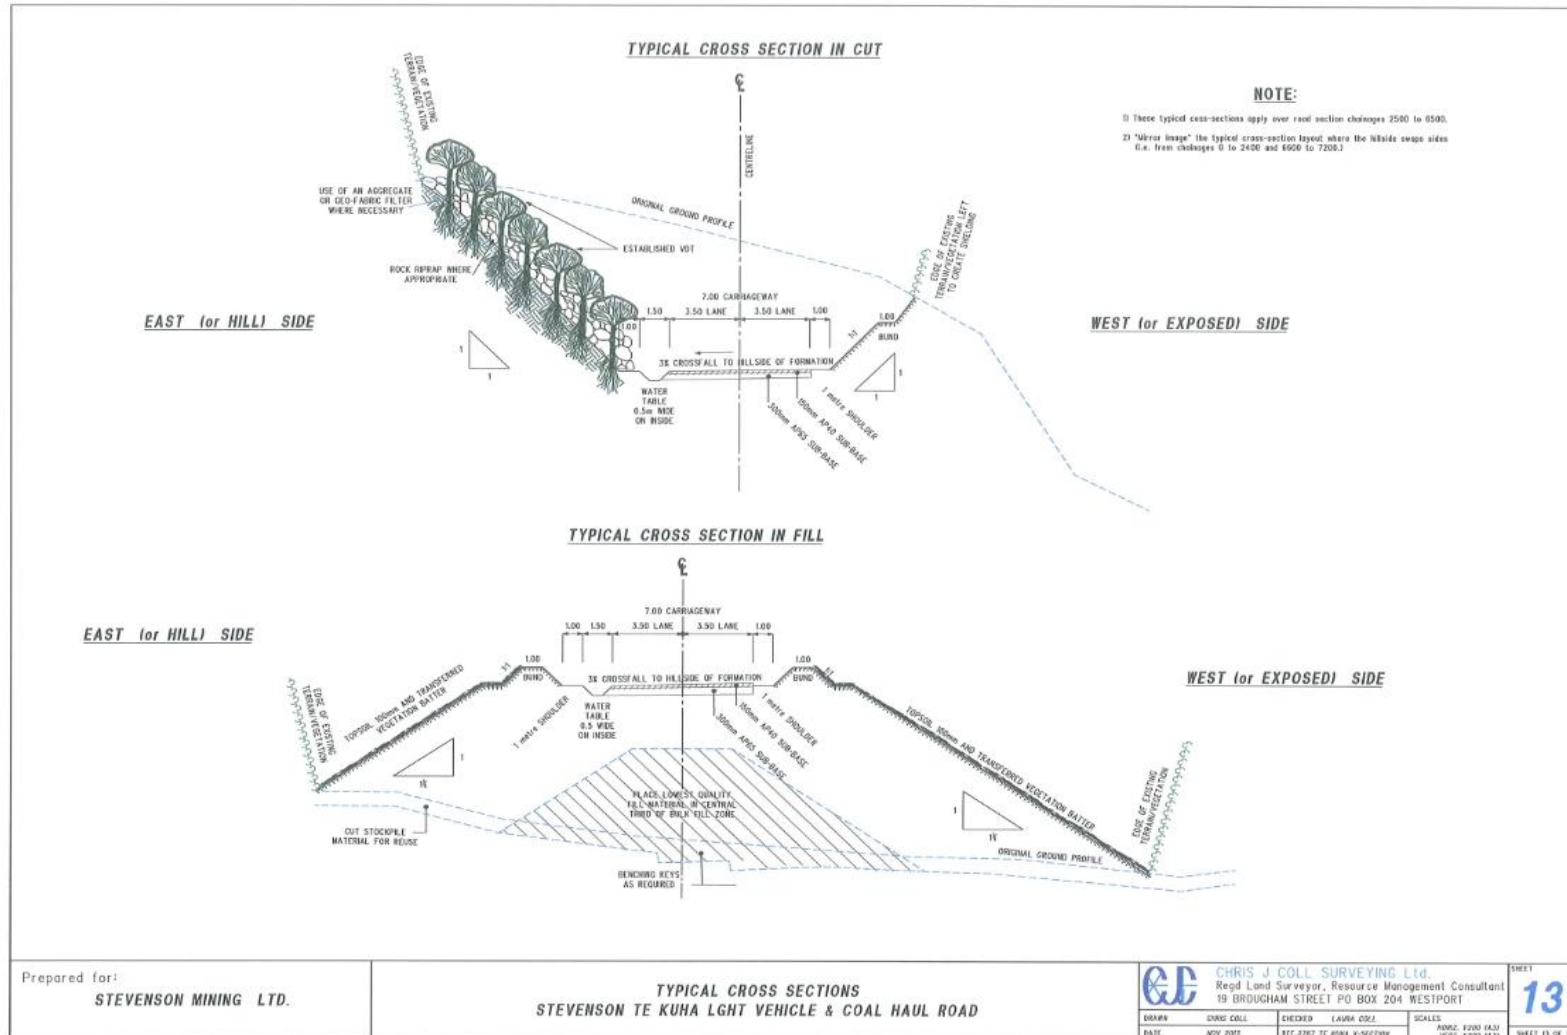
Typical Cross-Section - Te Kuha Haul Road Concept Plan
